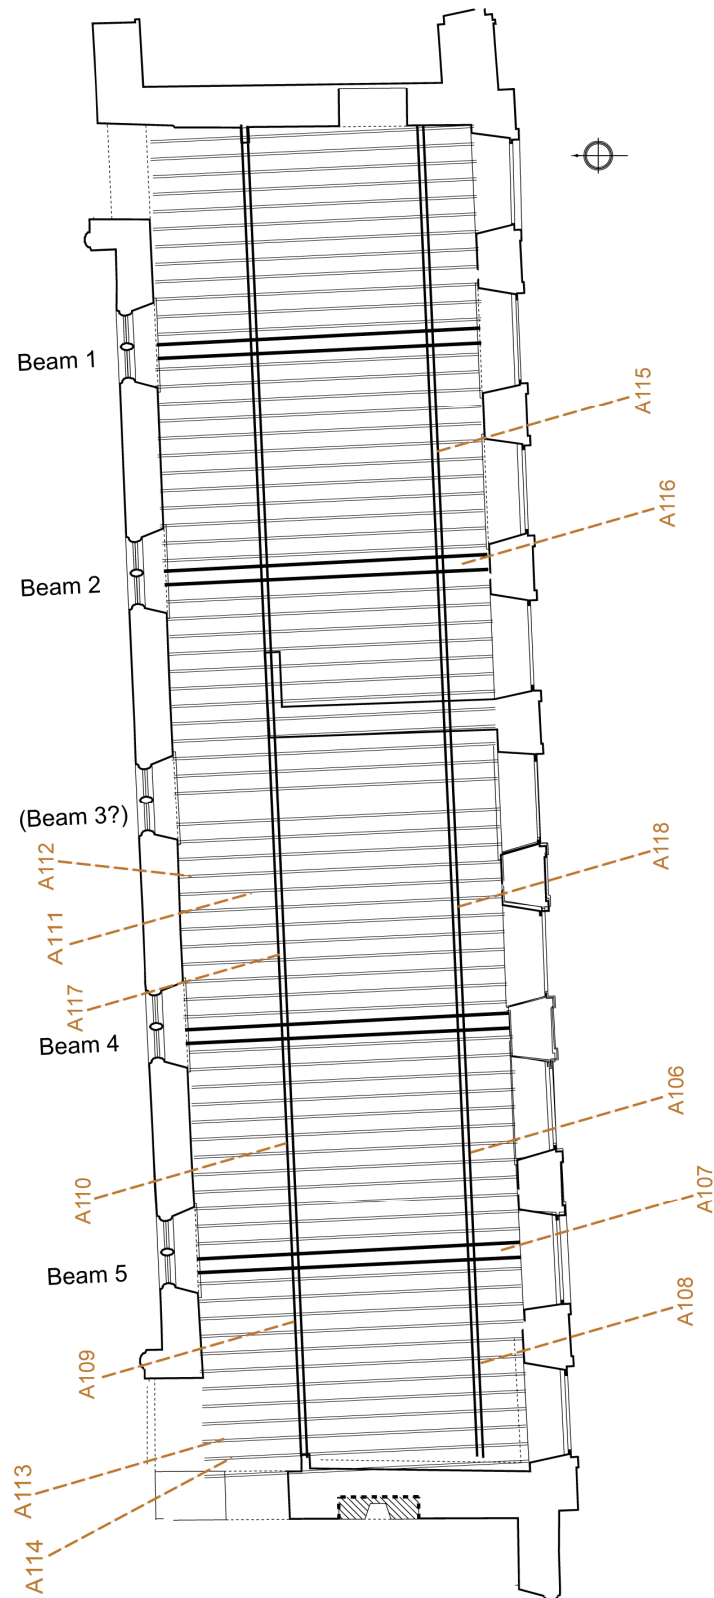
Orangery roof timbers, showing locations of samples APT-A106–18. Note APT-A111 is a joist at the same level as the main cross beams added to this roof plan
